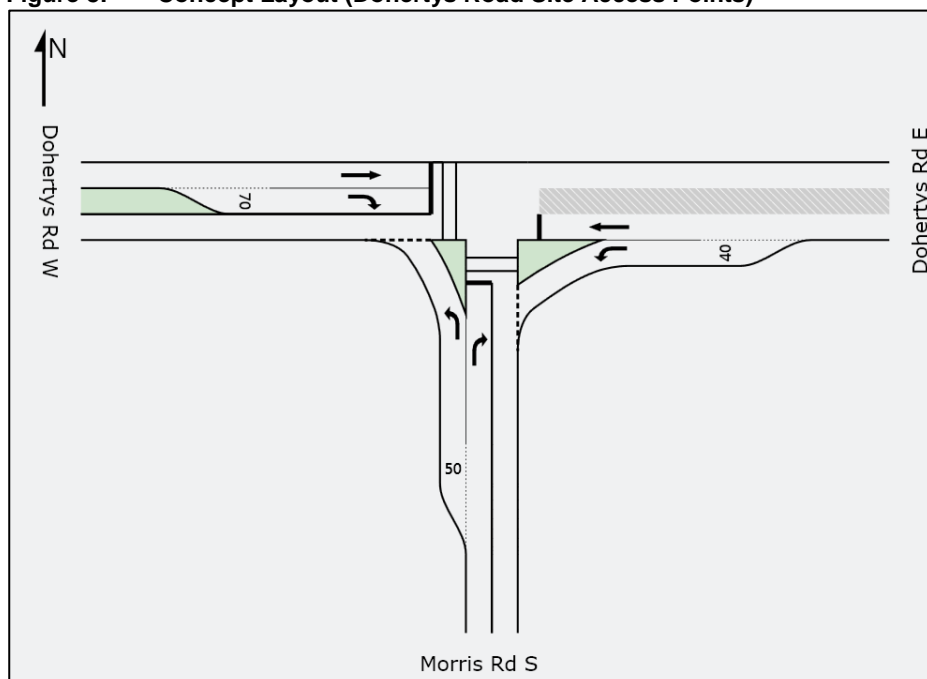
Concept Layout (Dohertys Road Site Access Points)
